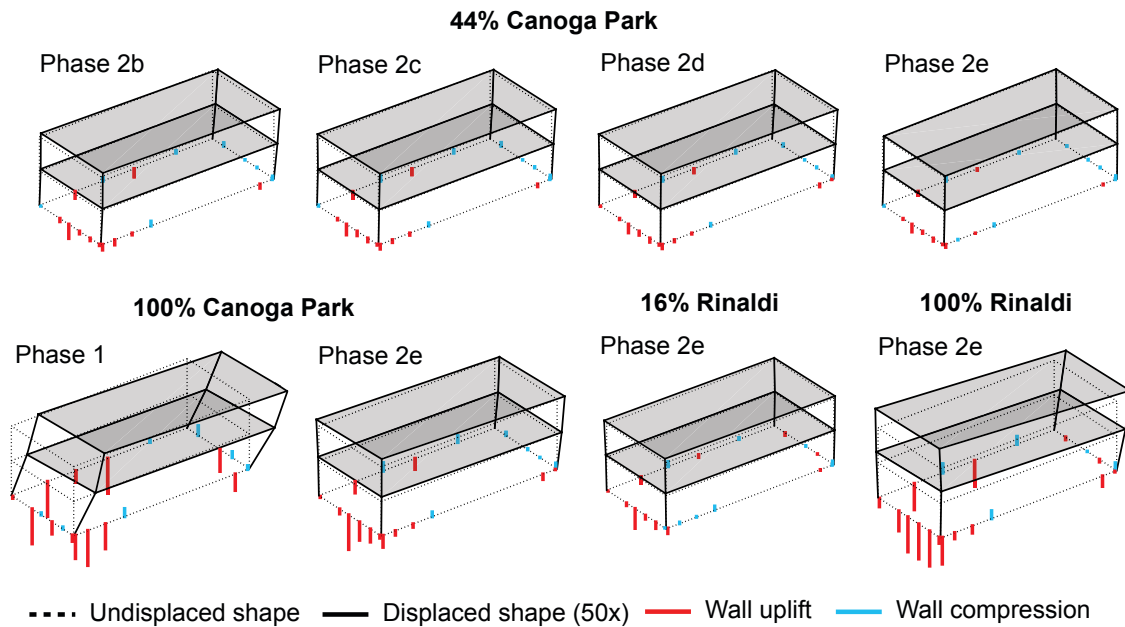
Shear wall anchor forces superimposed on the deformed and undeformed shapes of the building specimens at peak first story drift in the long direction (Schafer 2015)
